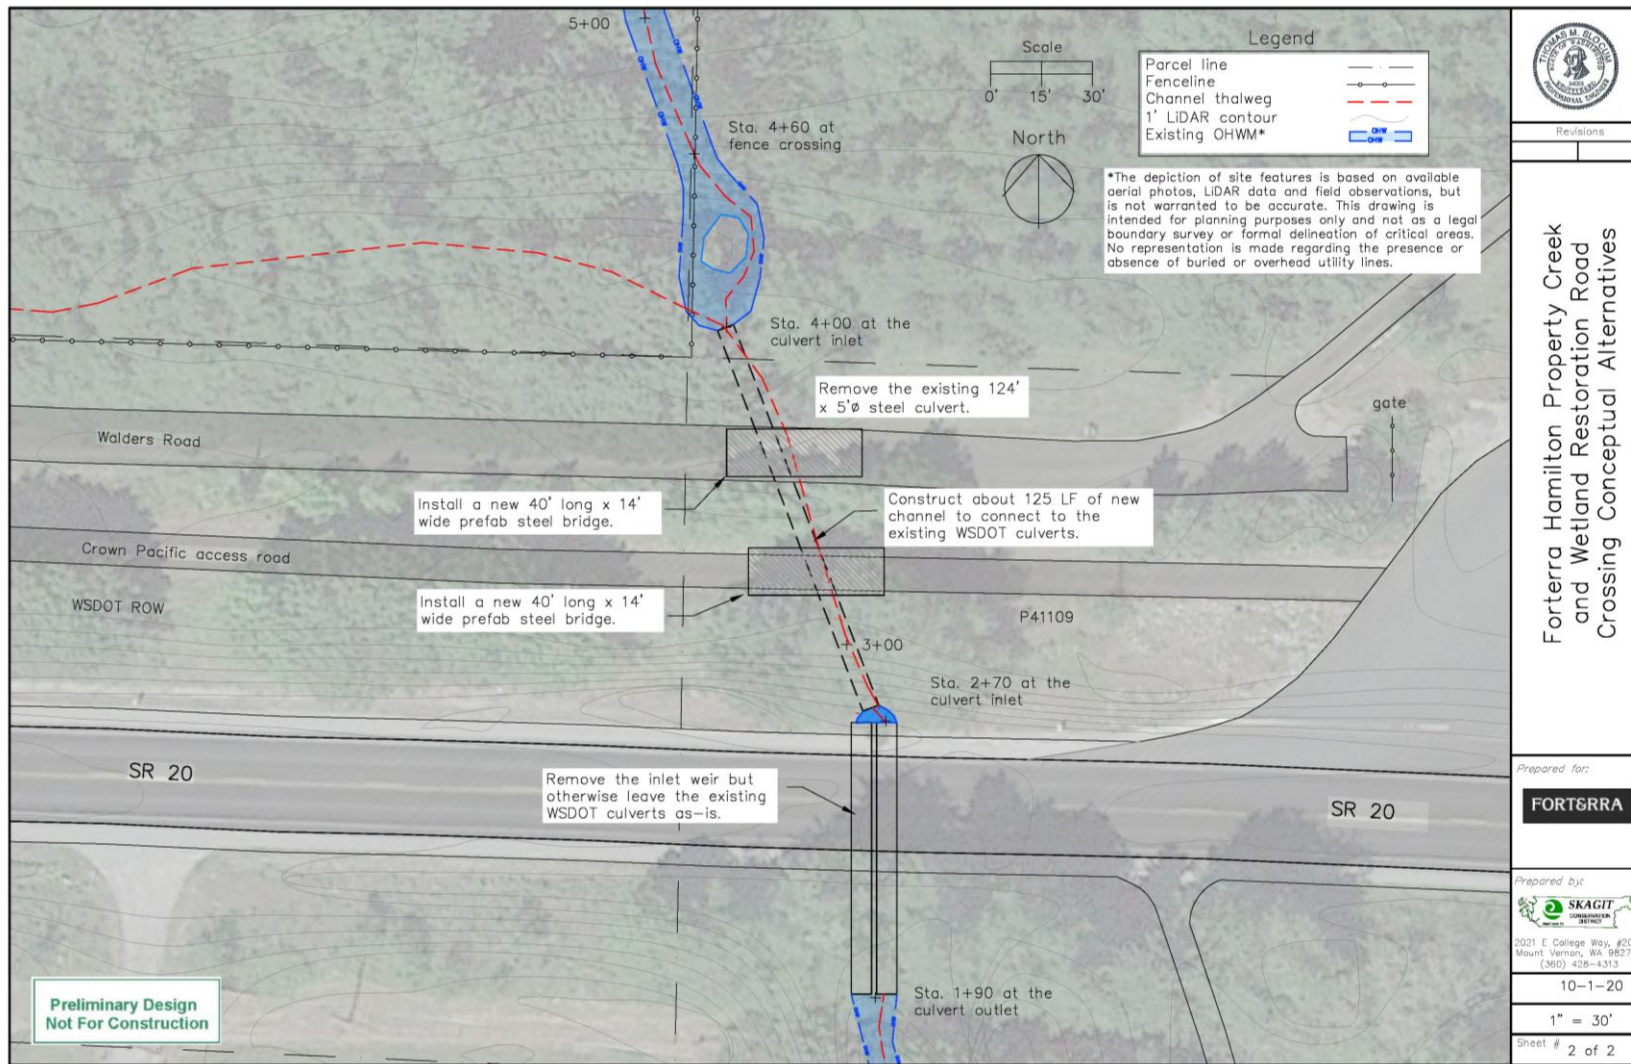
Area downstream where two new stream crossings are proposed under Walders Road and Crown Pacific Access Road.
